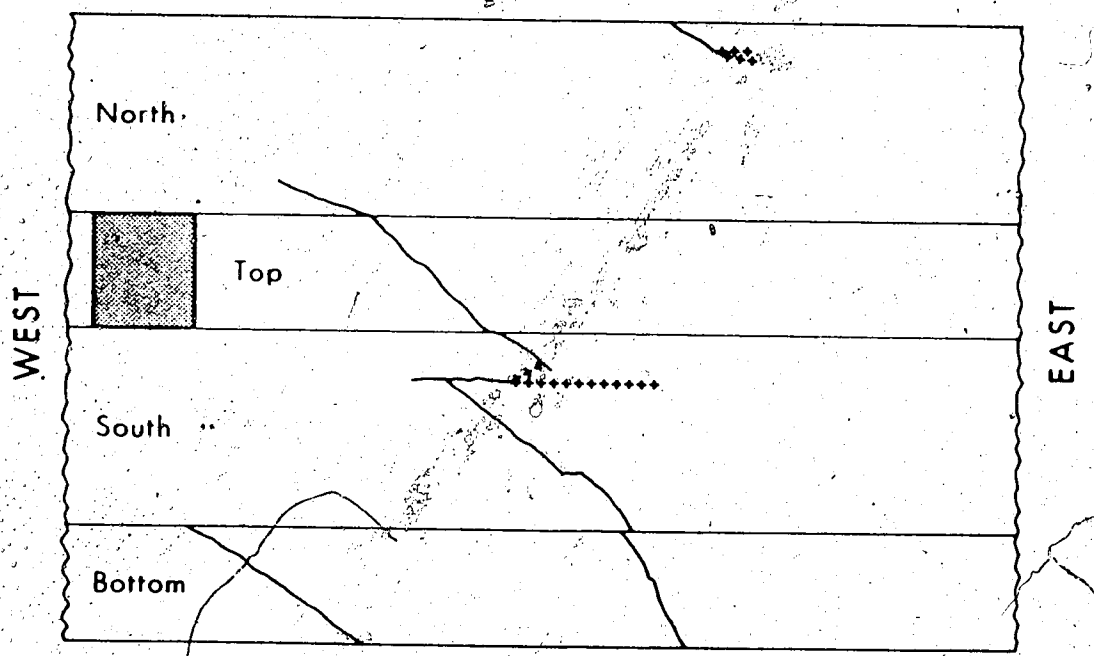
CRACK PATTERN FOR BEAMS A-4-3 AND B-4-3
